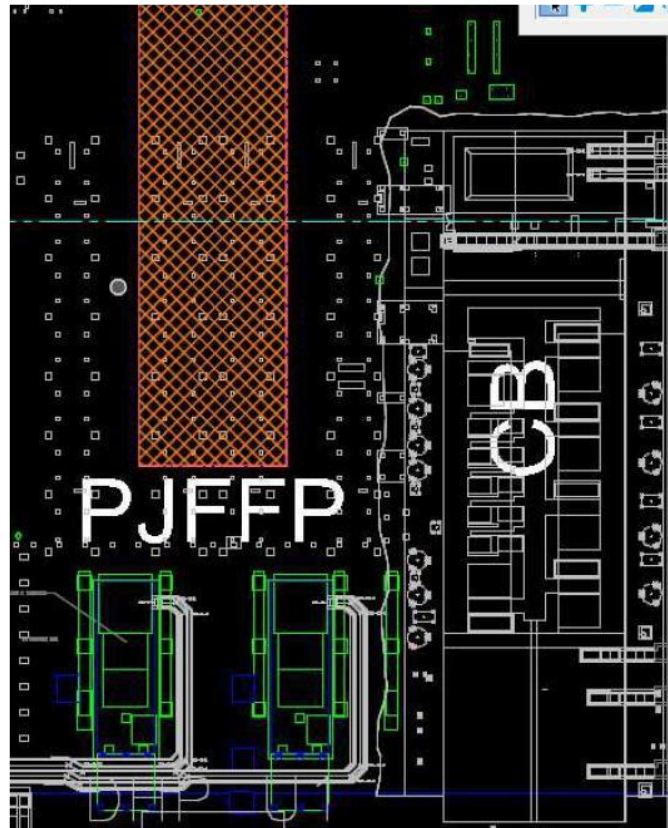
Site Layout – Compressor Buildings & PJFFP's
